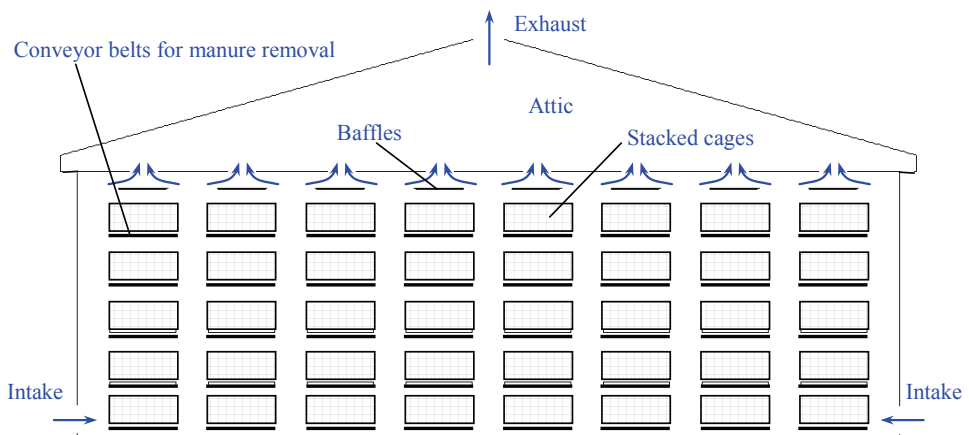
Proposed ventilation scheme airflow from bottom to top of house.
